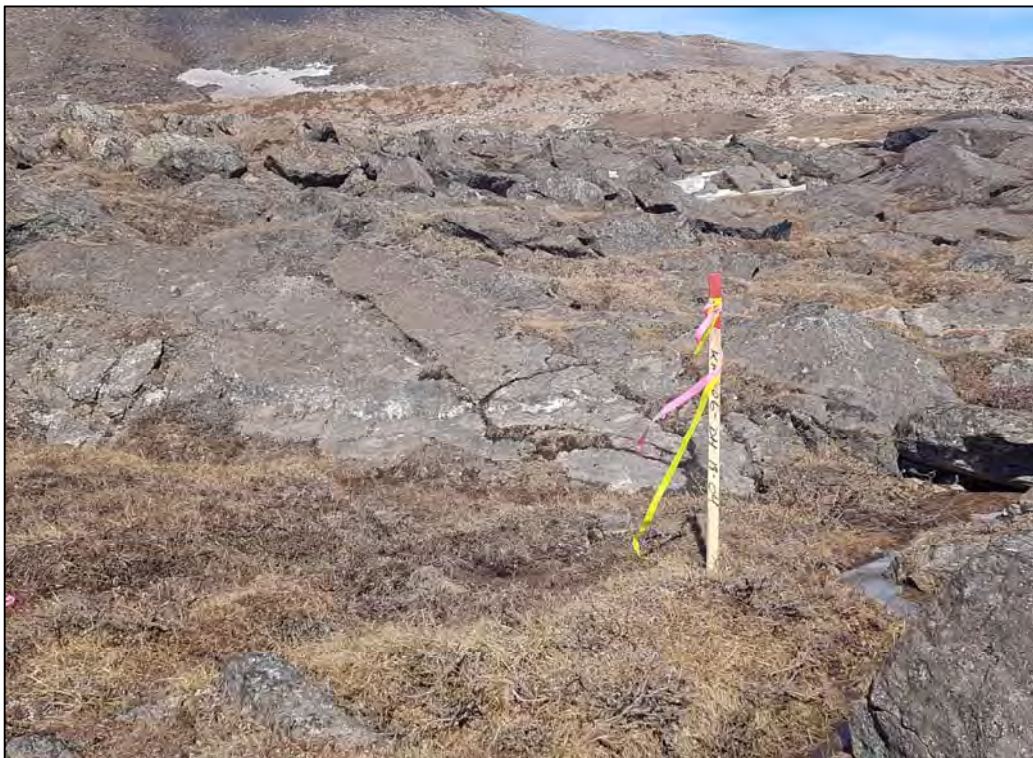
KM106-DH19-04 Looking North Before Drilling
